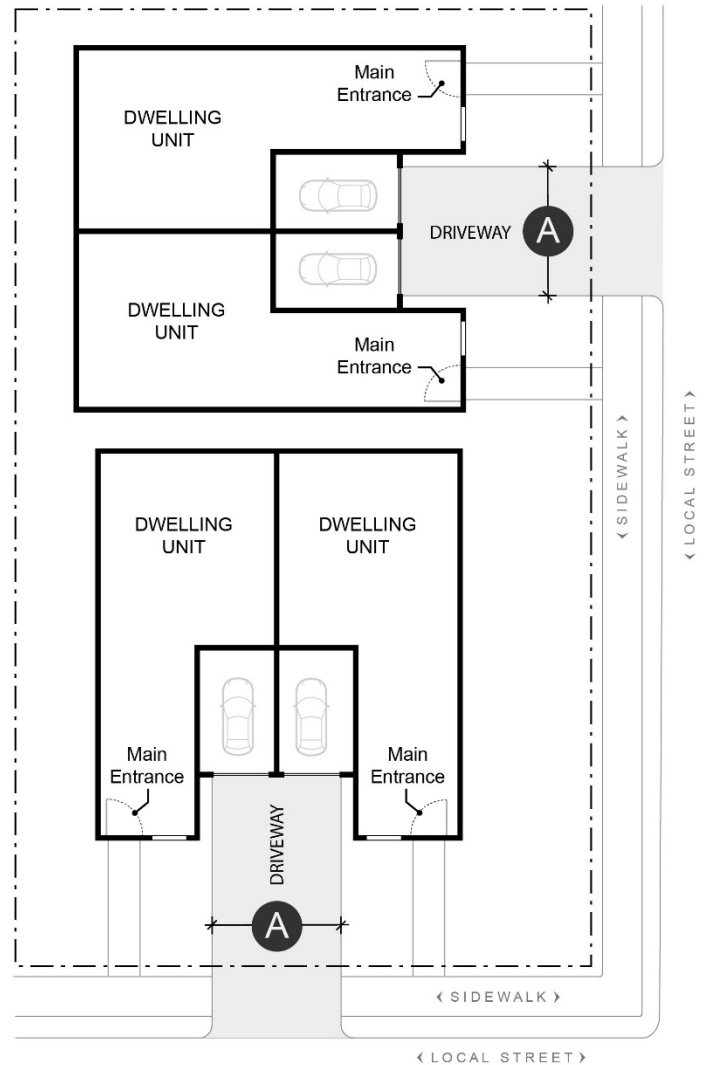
d. Driveway Approaches on One Local Street Frontage
